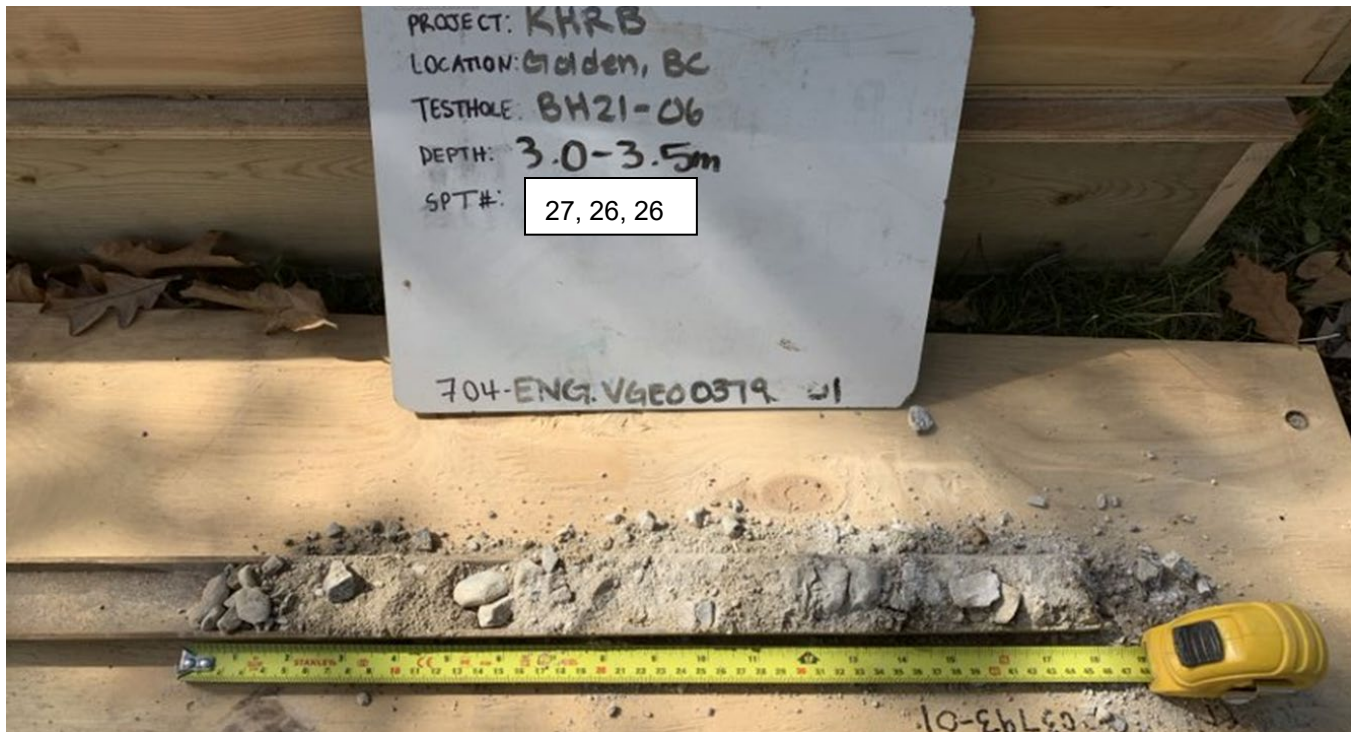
BH21-06, SPT02, 3.0 m to 3.5 m
